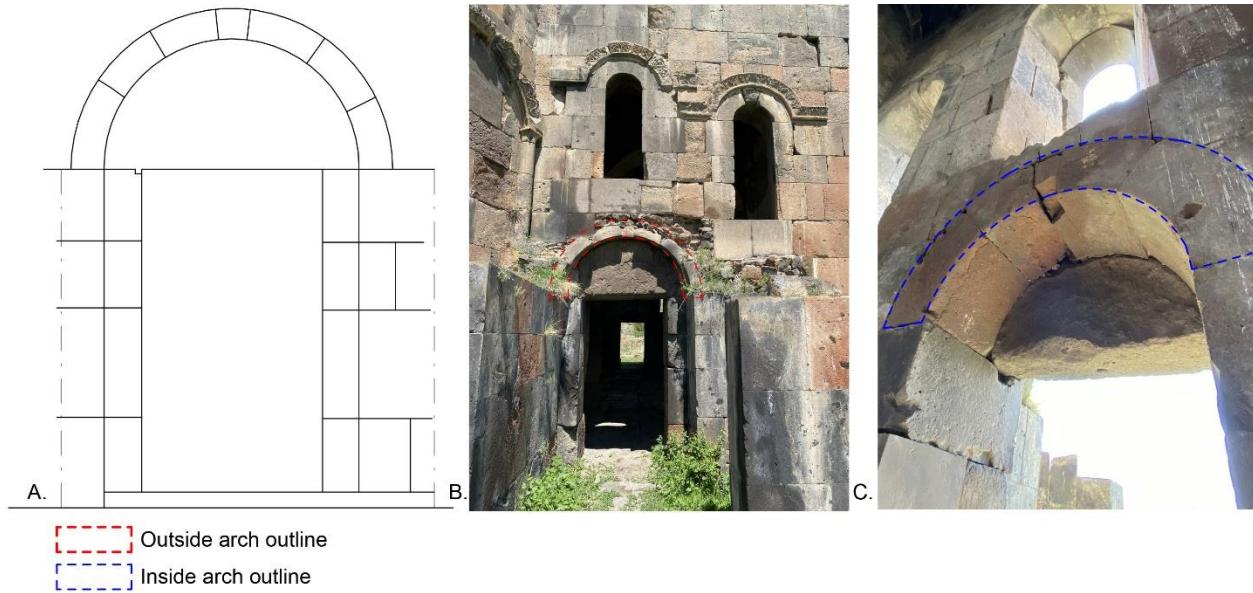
The right side portal on the western facade of the Talin Cathedral (7th century, Talin, Aragatsotn Province, Republic of Armenia): A) facade; B) general view from the outside; C) general view from the inside
